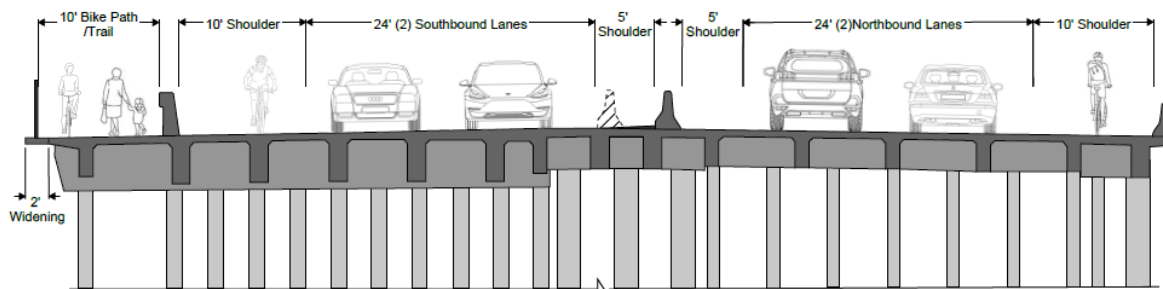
Conceptual Overview of Little River Bridge Design Approach
